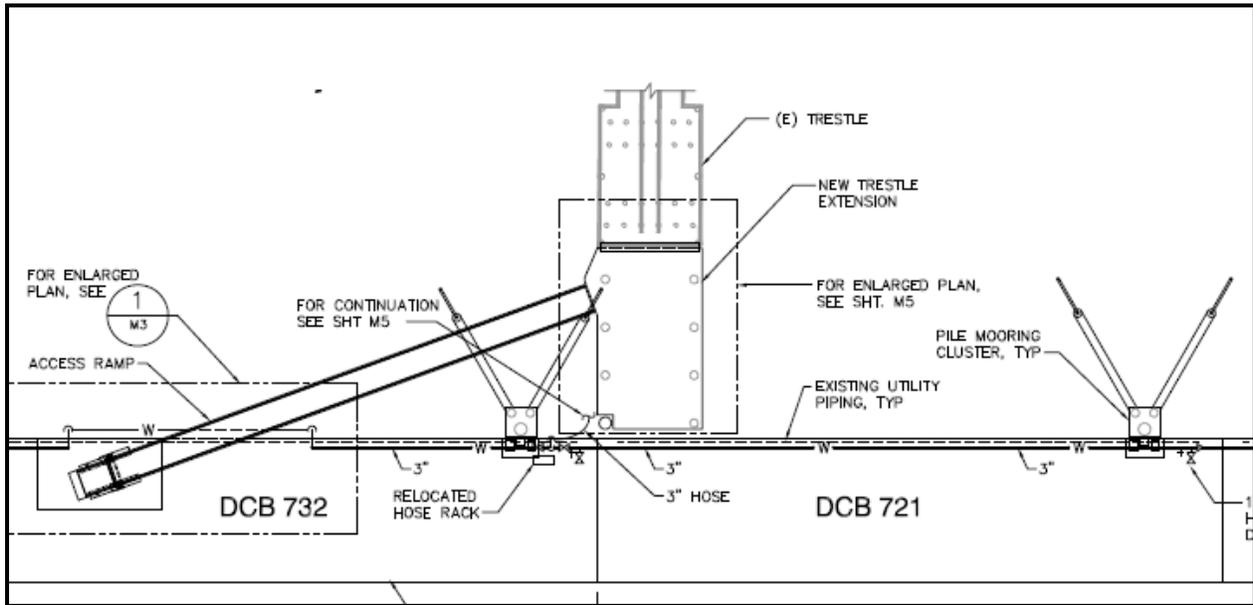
Trestle Extension, Access Ramp, Pile Clusters and Wharf
